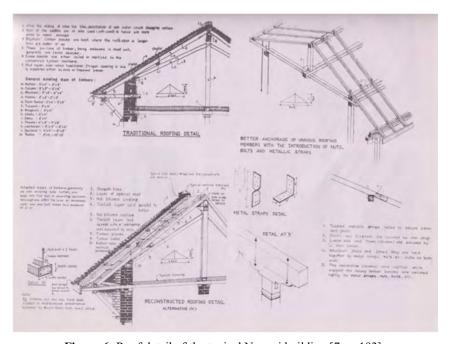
Roof detail of the typical Newari building [7, p. 193].
